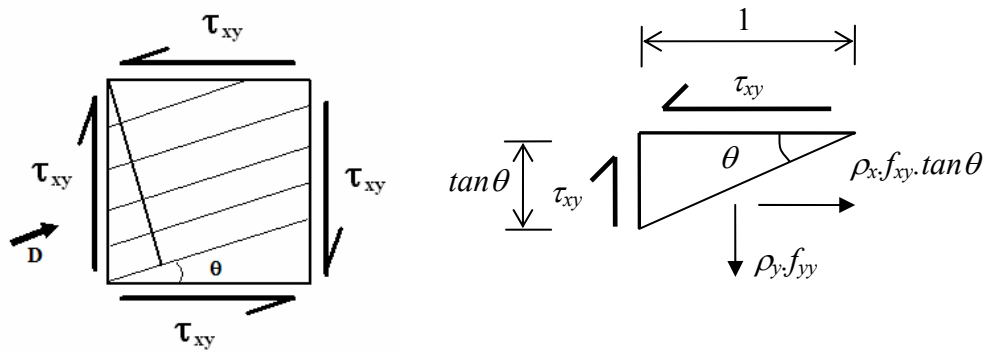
Rotating crack truss approach for shear panels; *Left*– Global forces; *Right*– Equilibrium of local stresses
